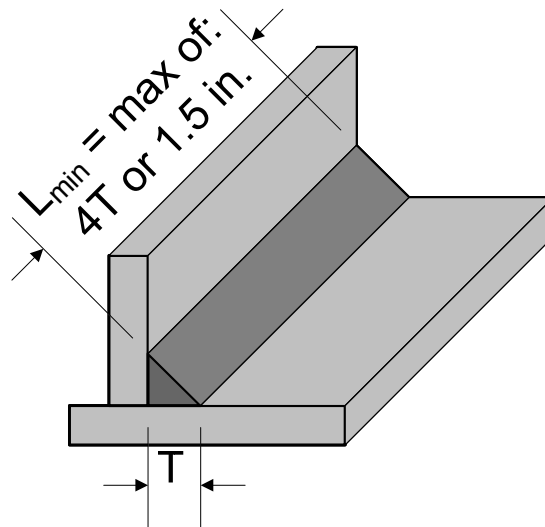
Minimum Effective Length of Fillet Welds
